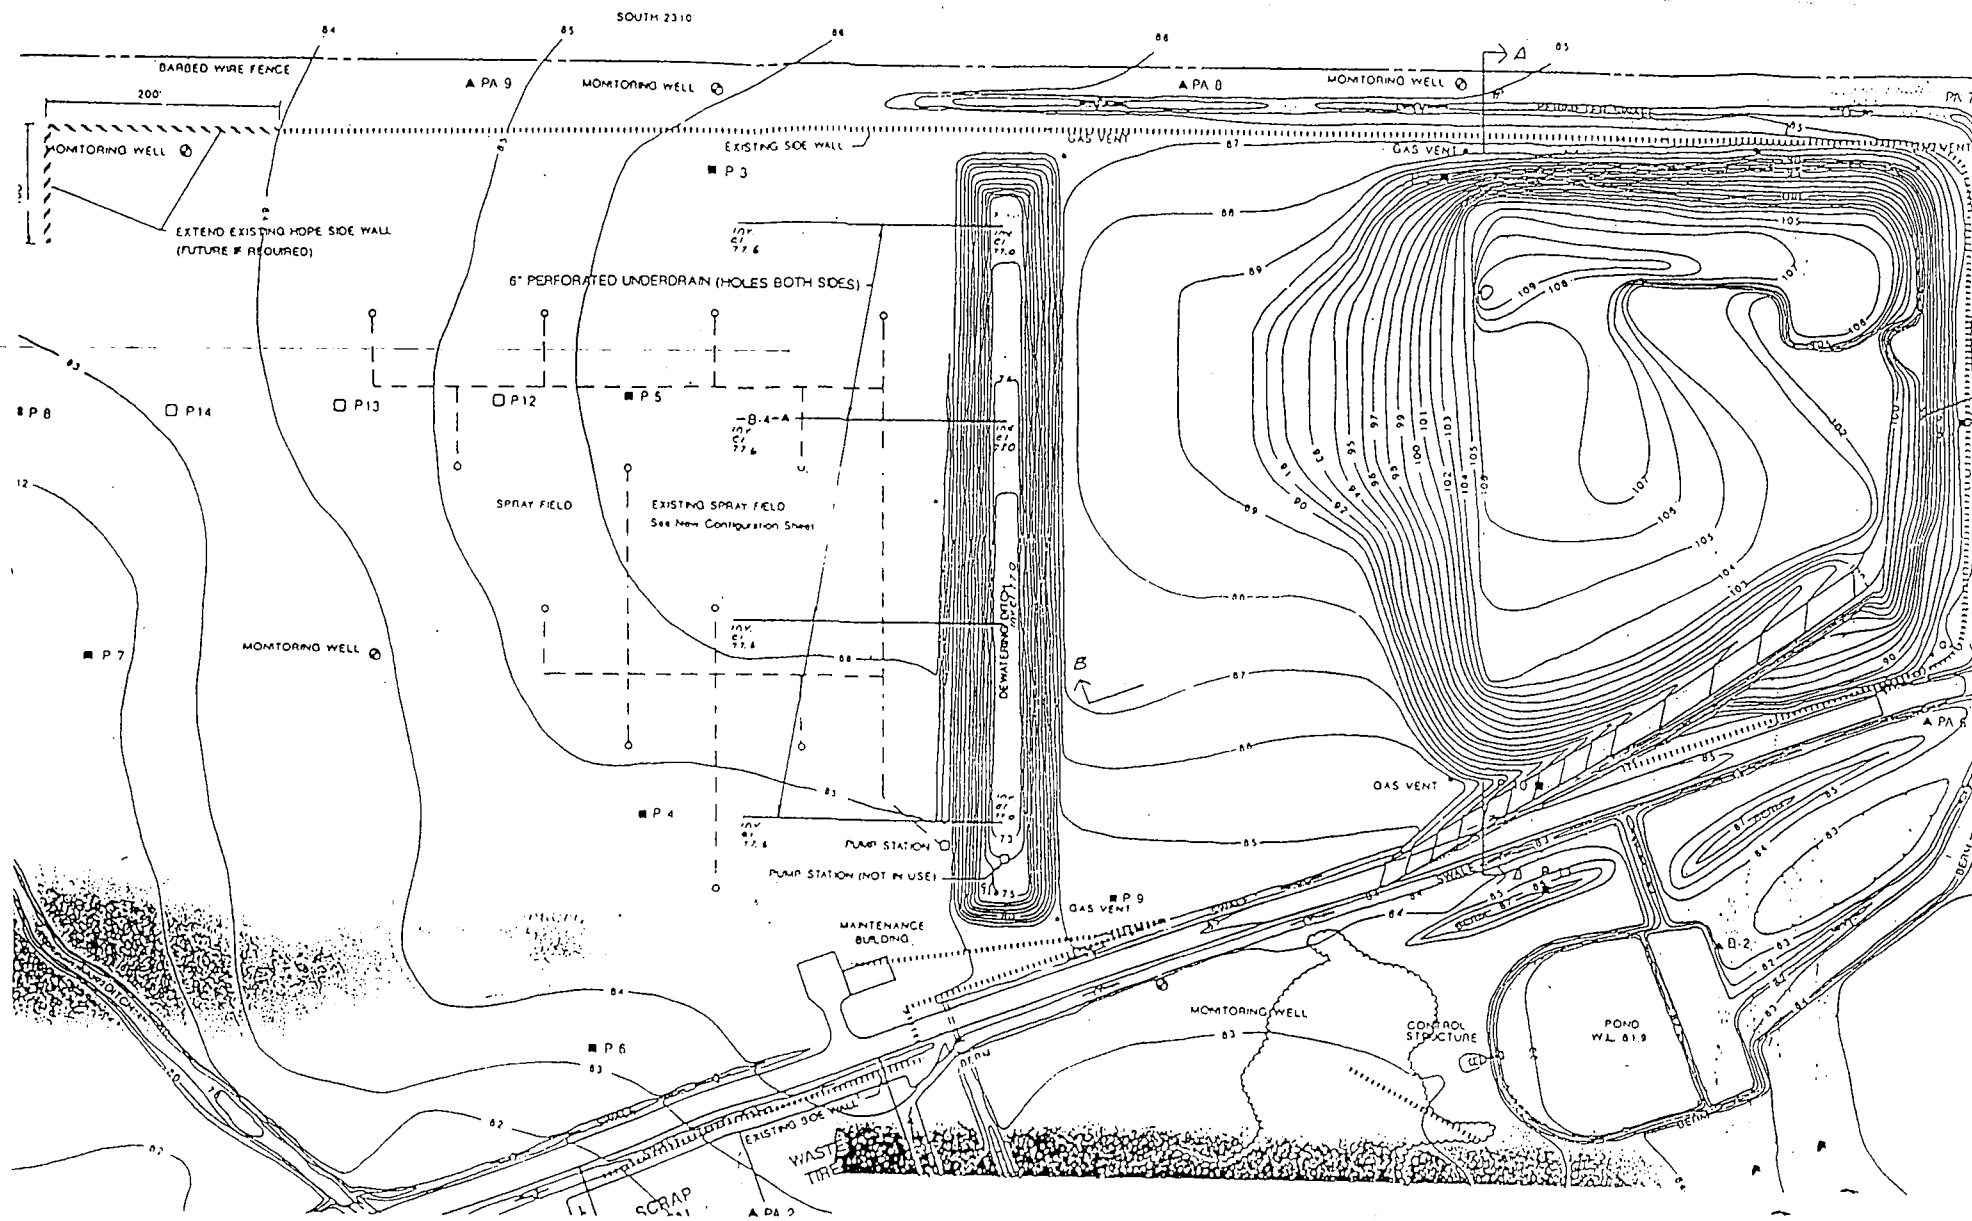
Improvement Site Plan (per 8/2/93 Wade-Trim Sheet 4/6)
